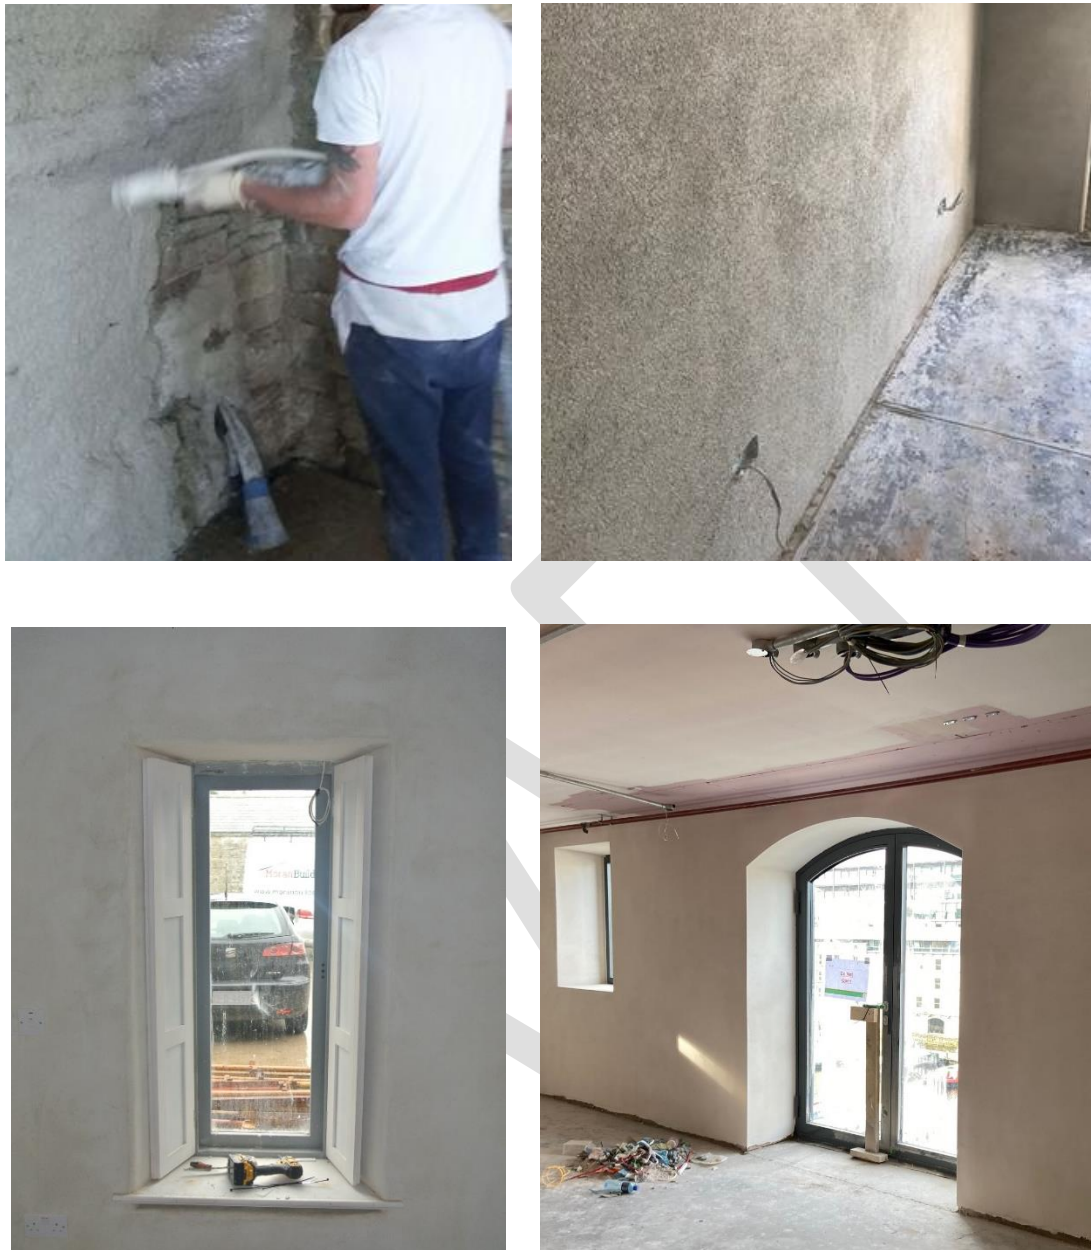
Cork lime plaster insulation sprayed on an uneven wall, providing an even finish to the wall.
